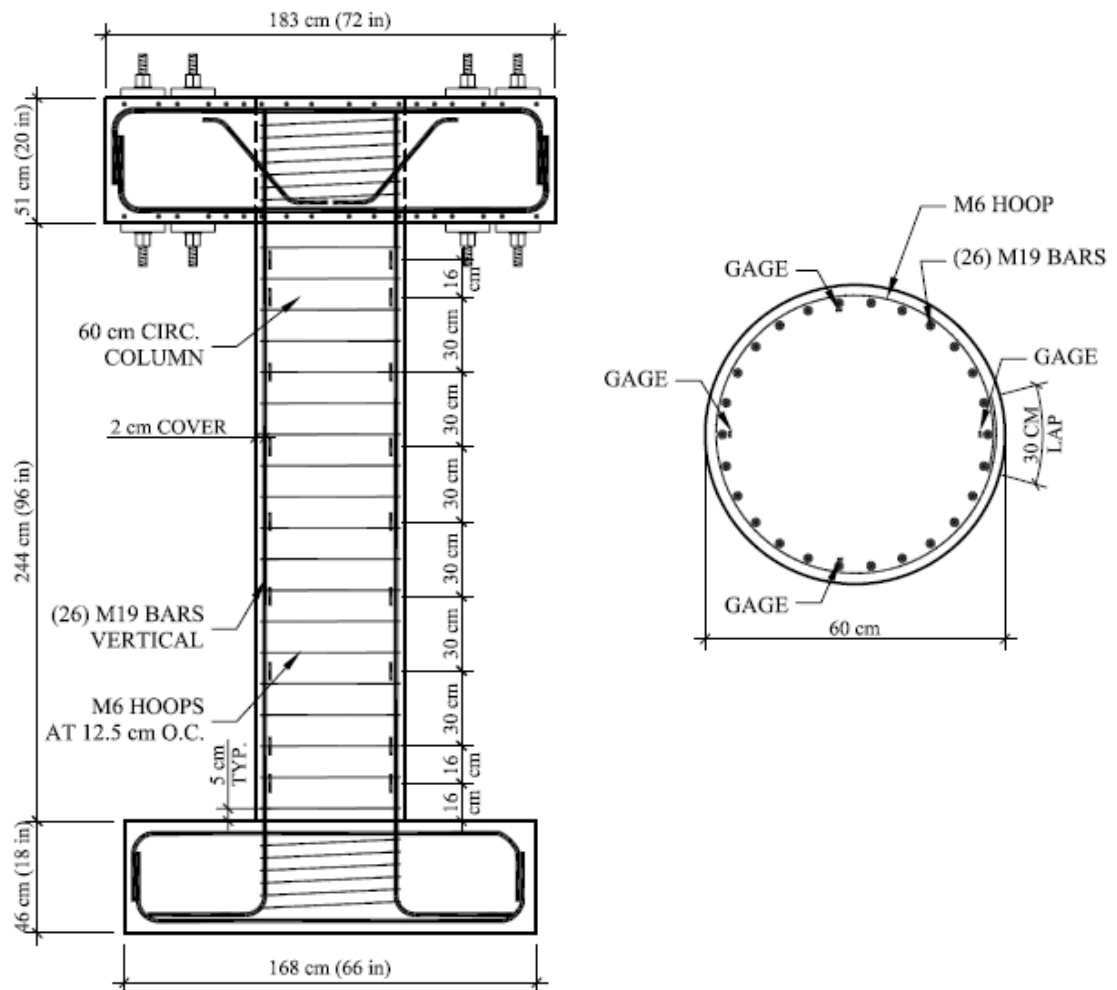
Schematic Showing Strain Gage Location on Circular Shear Column Reinforcing Cage
